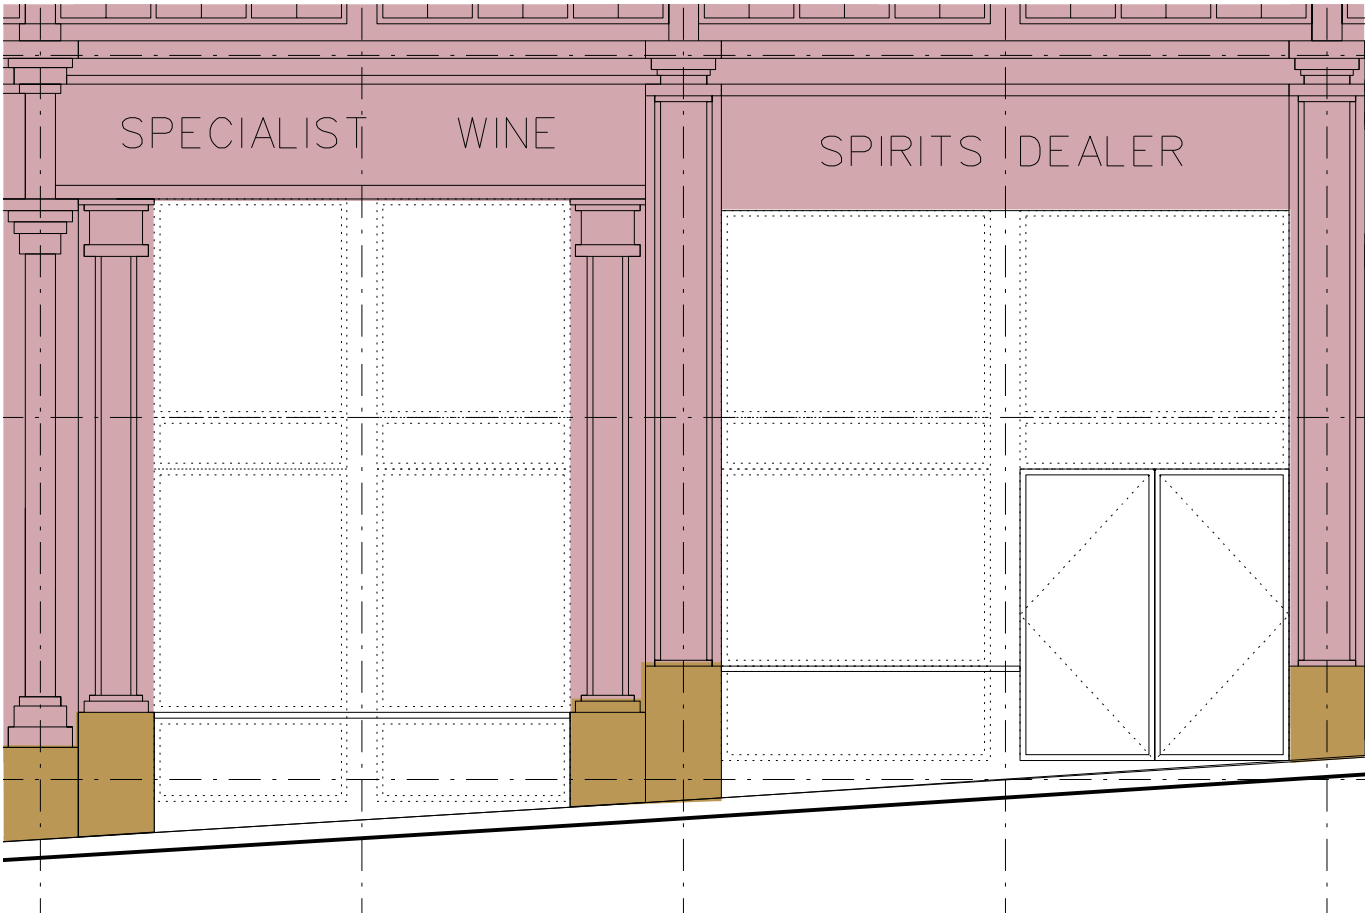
Greville Street elevation to highlight areas which have been folded to increase stability and which areas are to have additional mesh internal fins added.
